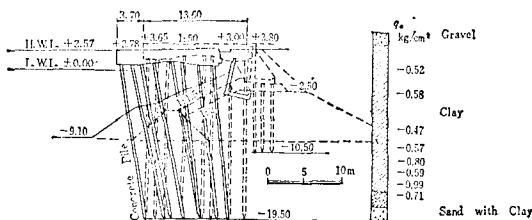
Cross Section of Trestle Type Pier in Yokkaichi Port
